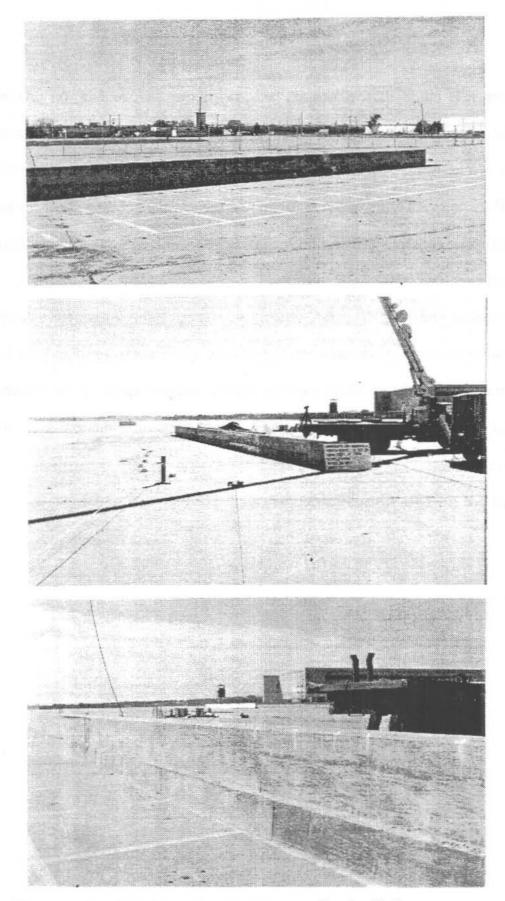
Photographs of the Iowa Retrotit Concrete Barrier Rail.
